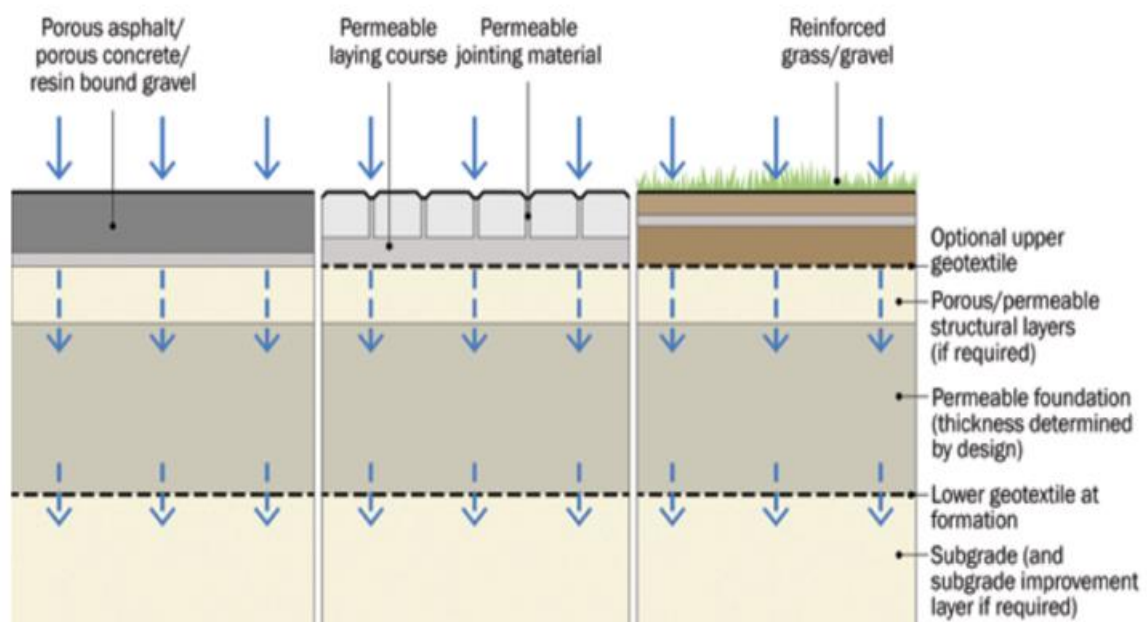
Section view of three types of pervious pavements. Source: (Woods-Ballard, et al., 2015)
